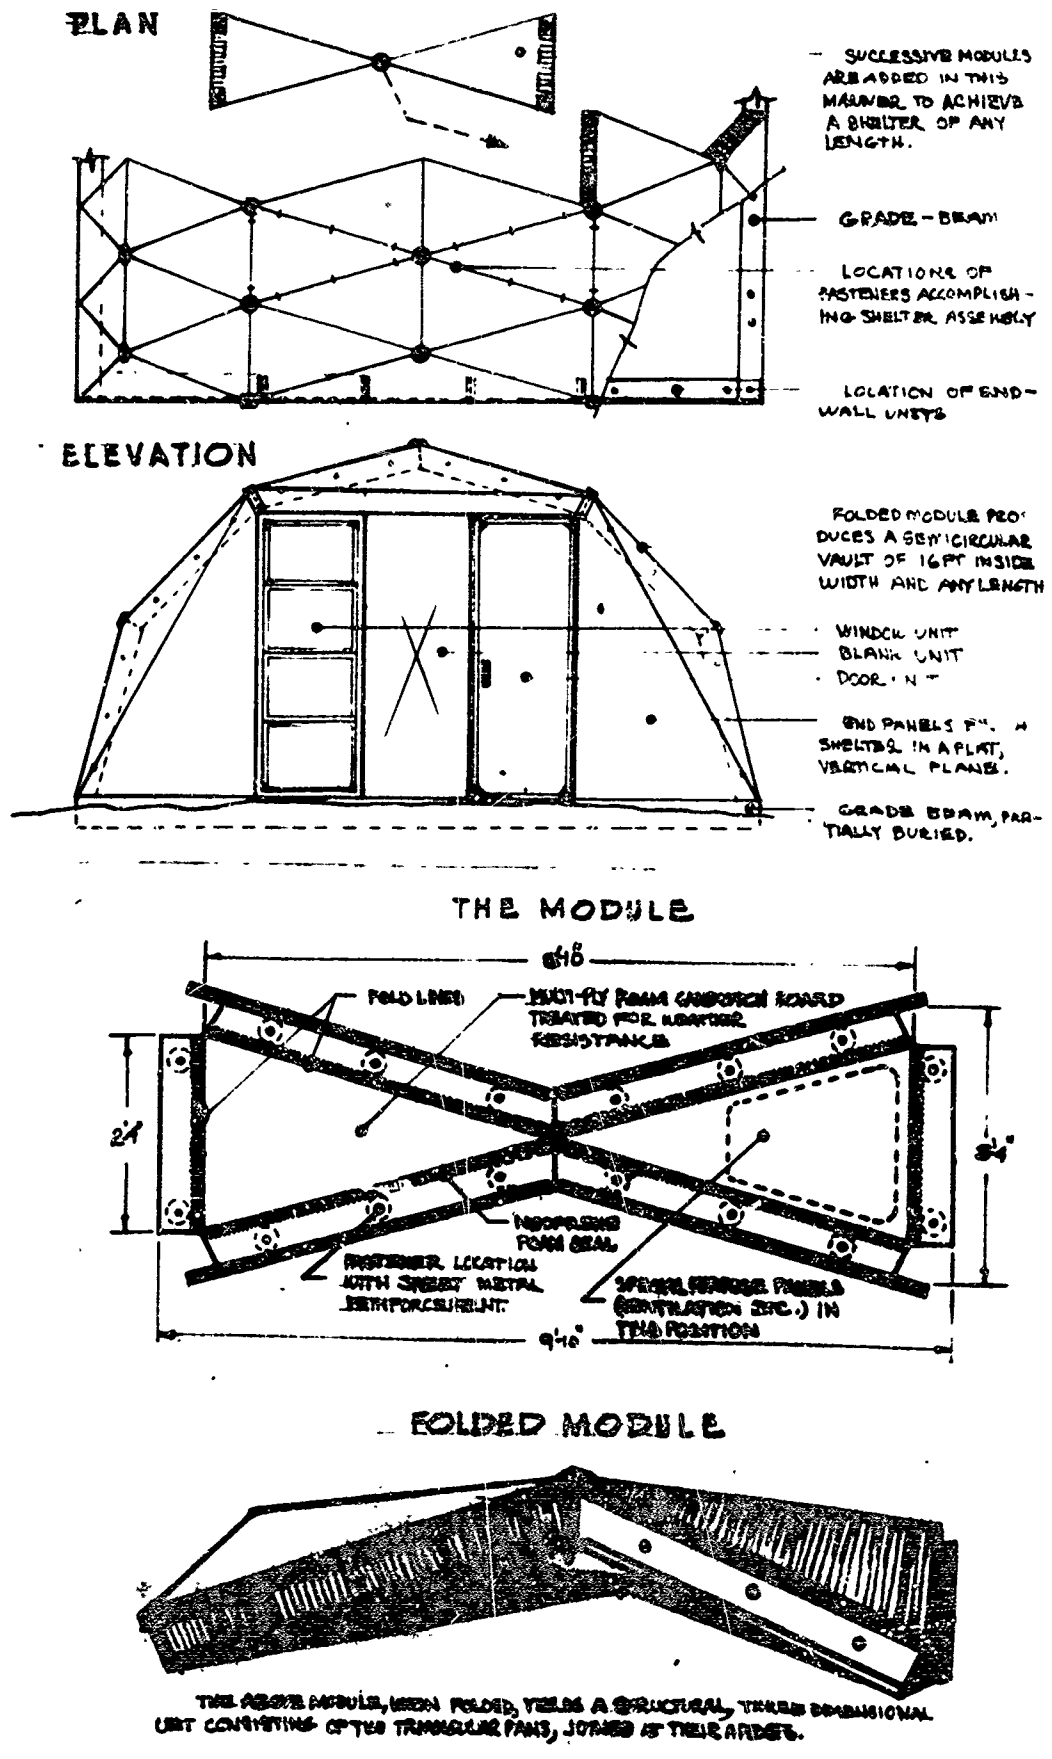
Plan, elevation, and module drawings, "bow-tie" concept. Shelter # 1.
